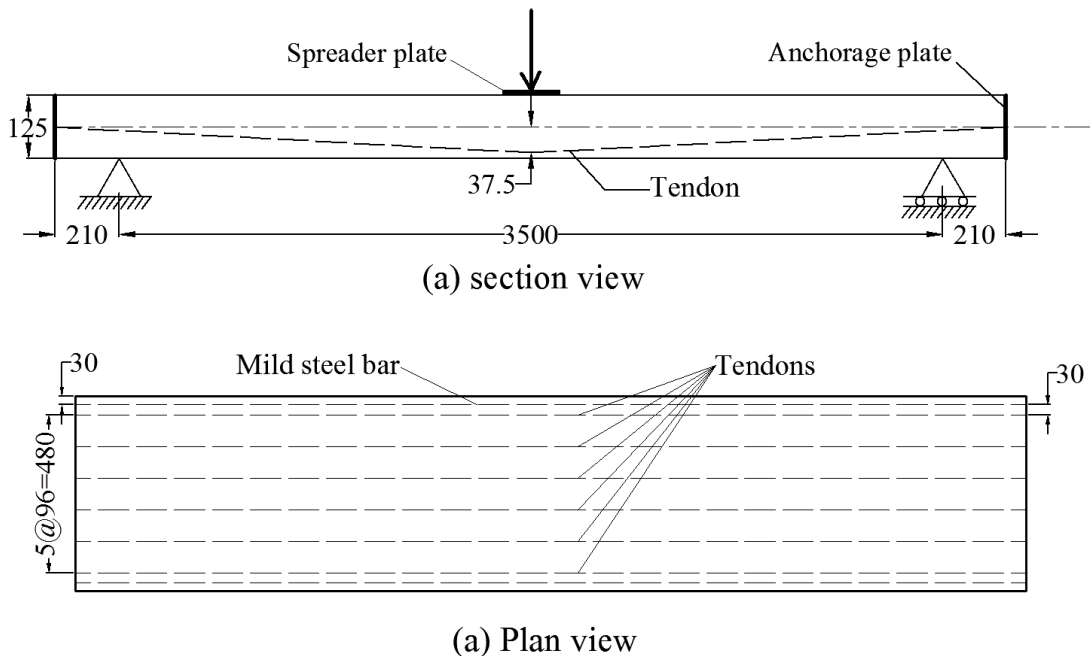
Details of slab geometry and arrangement of reinforcement of UPT slab 1-H35 (Yang et al., 2013) (dimensions are in mm).
